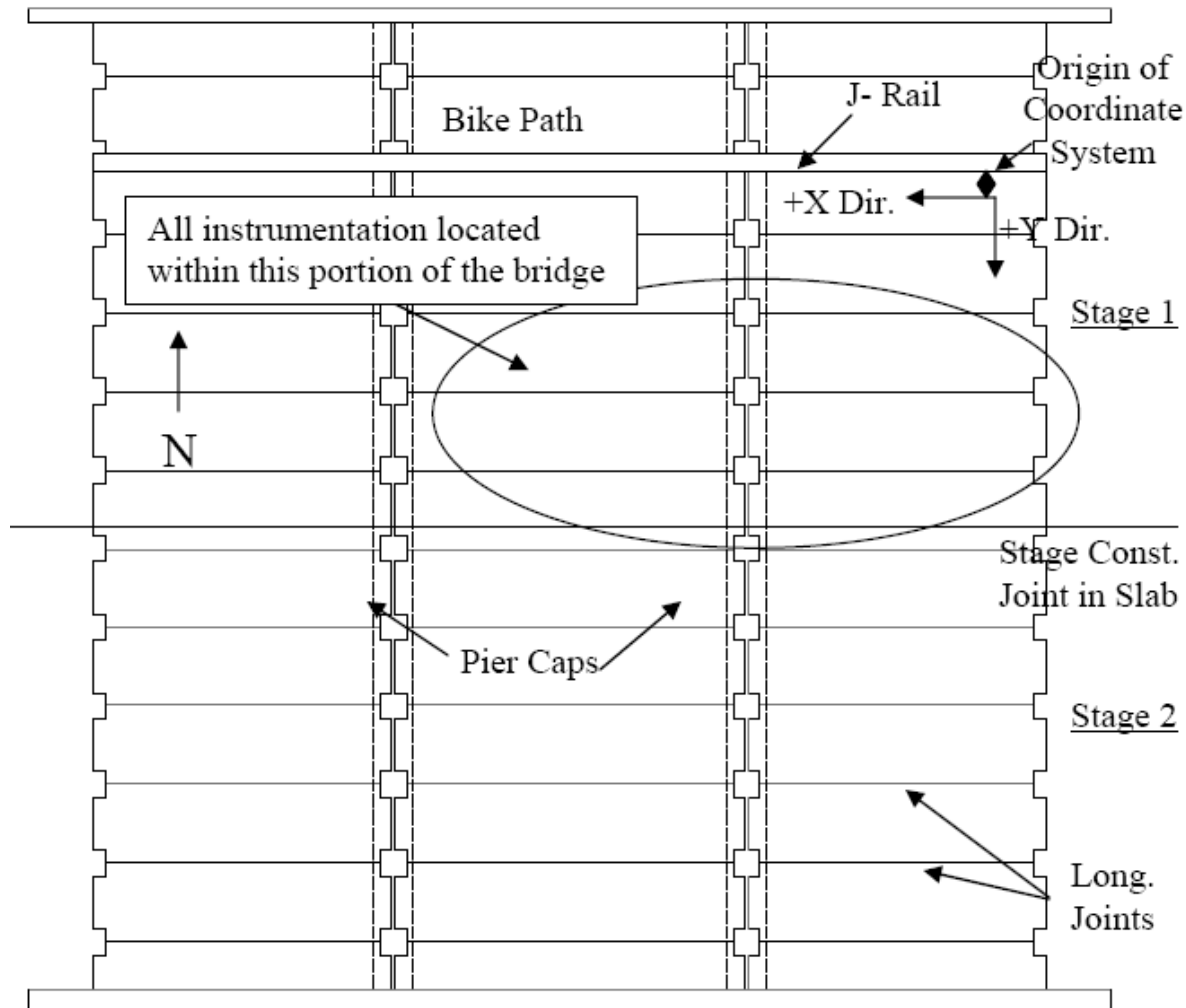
Plan view and construction stages of Mn/DOT Bridge No. 13004 in Center City, Minnesota (Bell et al. 2006)
